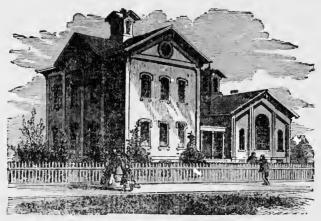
,-Design No. 40,-Perspective View of Two-storey School-House,
